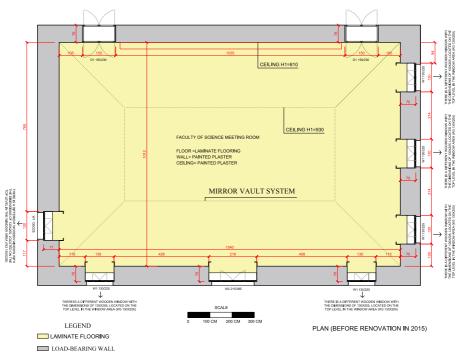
Meeting room plan before the renovation carried out in 2015*. P a g e 98 | 130
